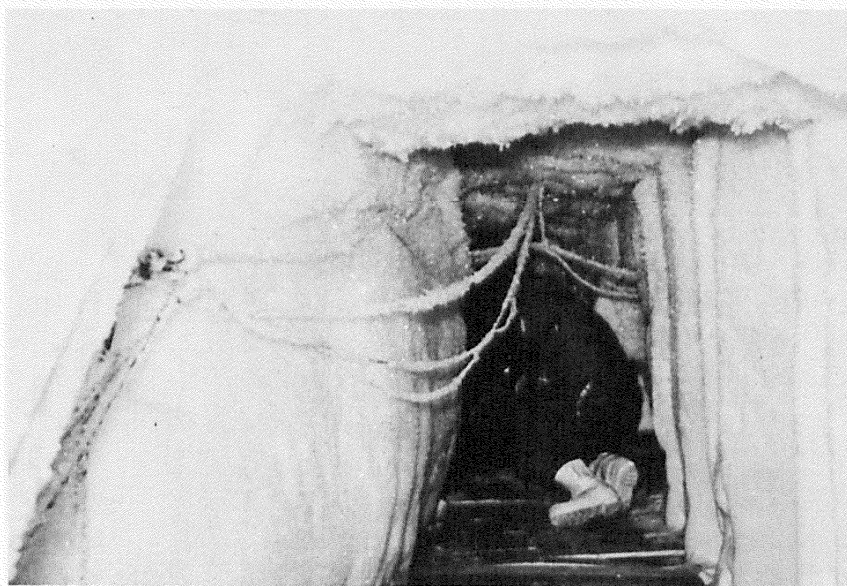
Metal roof arch deformation and snow encroachment upon Jamesway (Trench 10).
